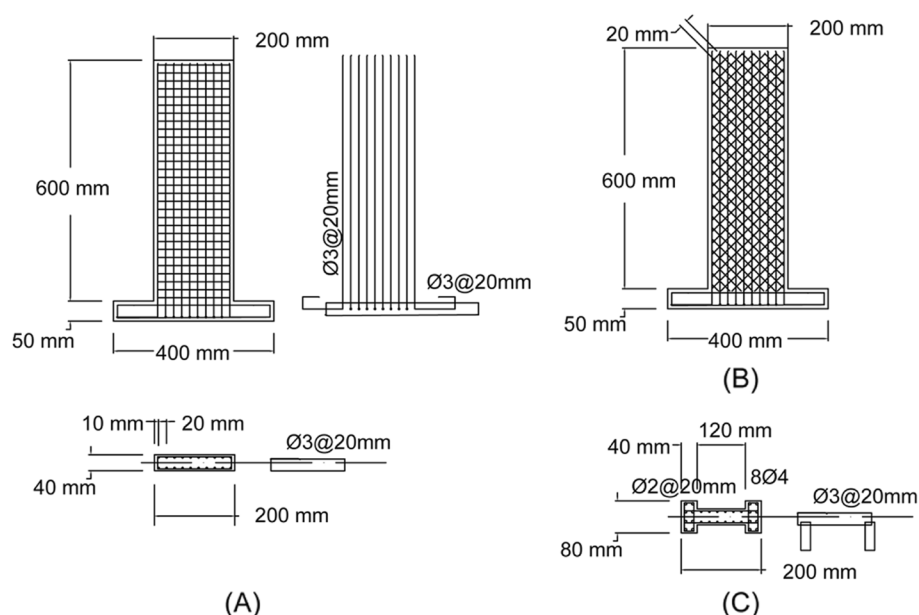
A Typical reinforcement detailing for scaled shear wall, B reinforcement detailing for inclined stirrups, and C cross-section of shear wall with end enlargement and steel concentration
